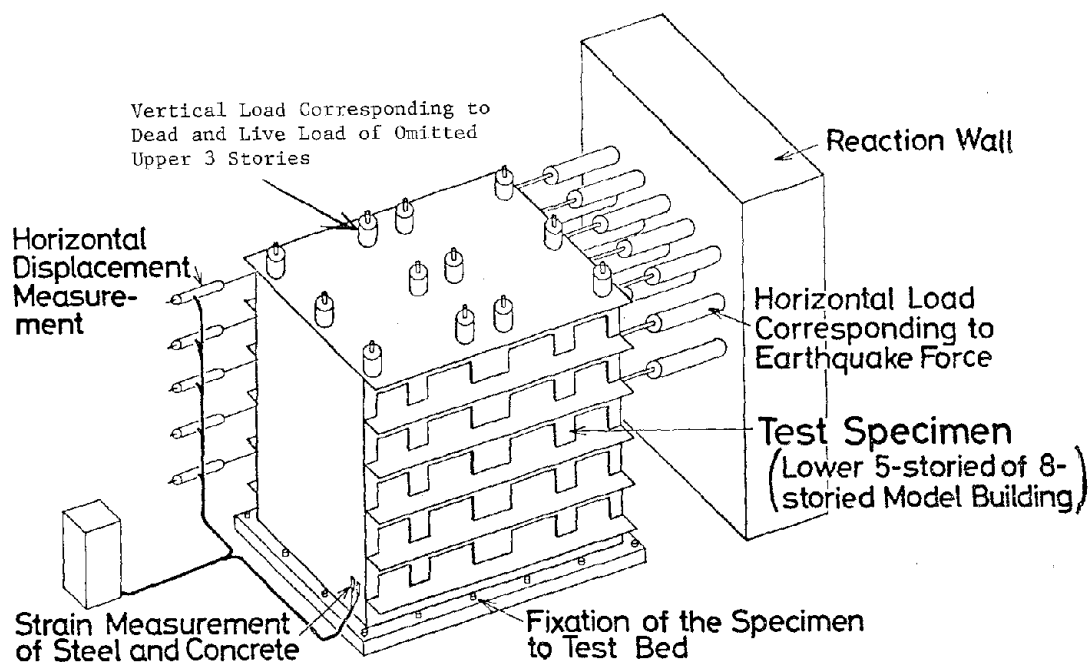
LOADING AND MEASURING SYSTEMS APPLIED TO THE TEST
